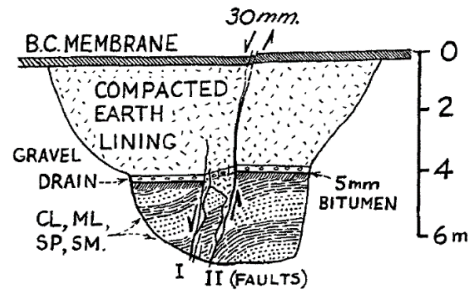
Foundation of the Reservoir after the failure (Stapledon, 1976)
